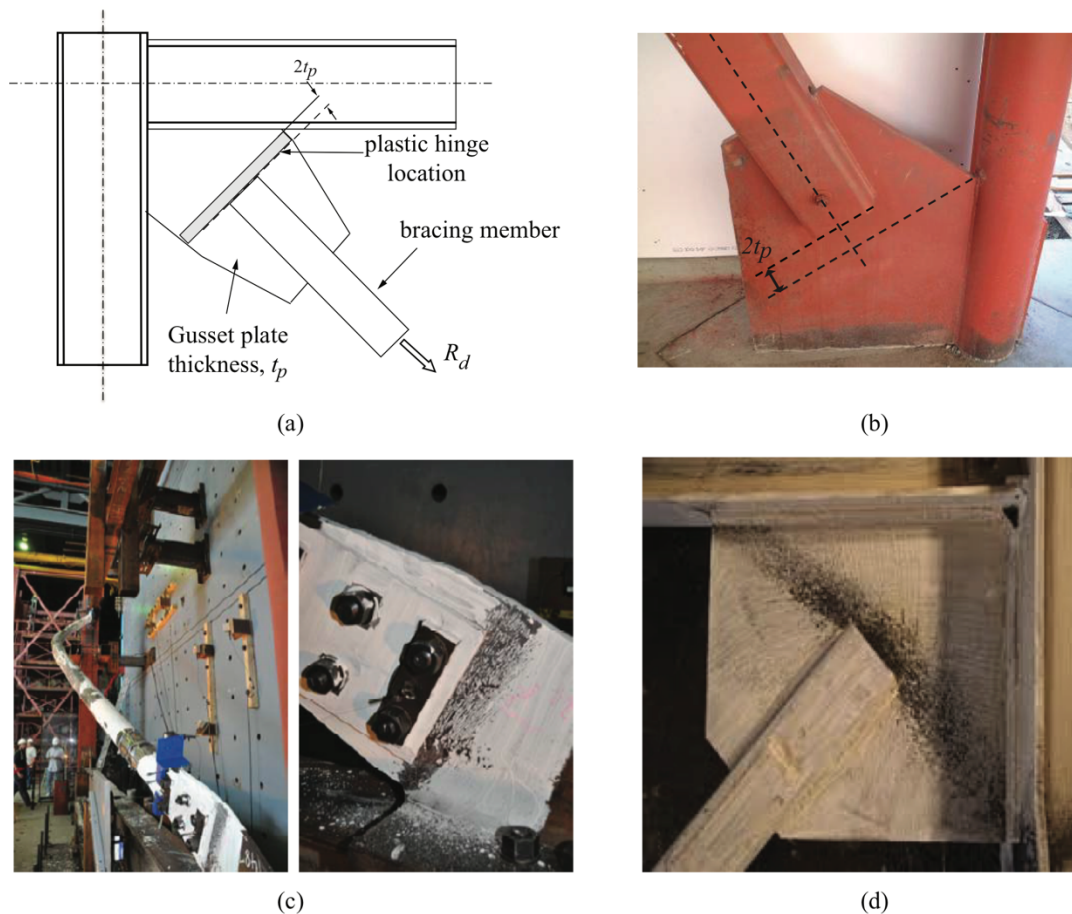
Typical gusset plate detailing to ensure ductile behaviour of bracing connections (image “b” courtesy of Prof. Dr. R. Tremblay; image “c” from de Oliveira et al. 2011; image “d” from Lehman et al. 2008)
